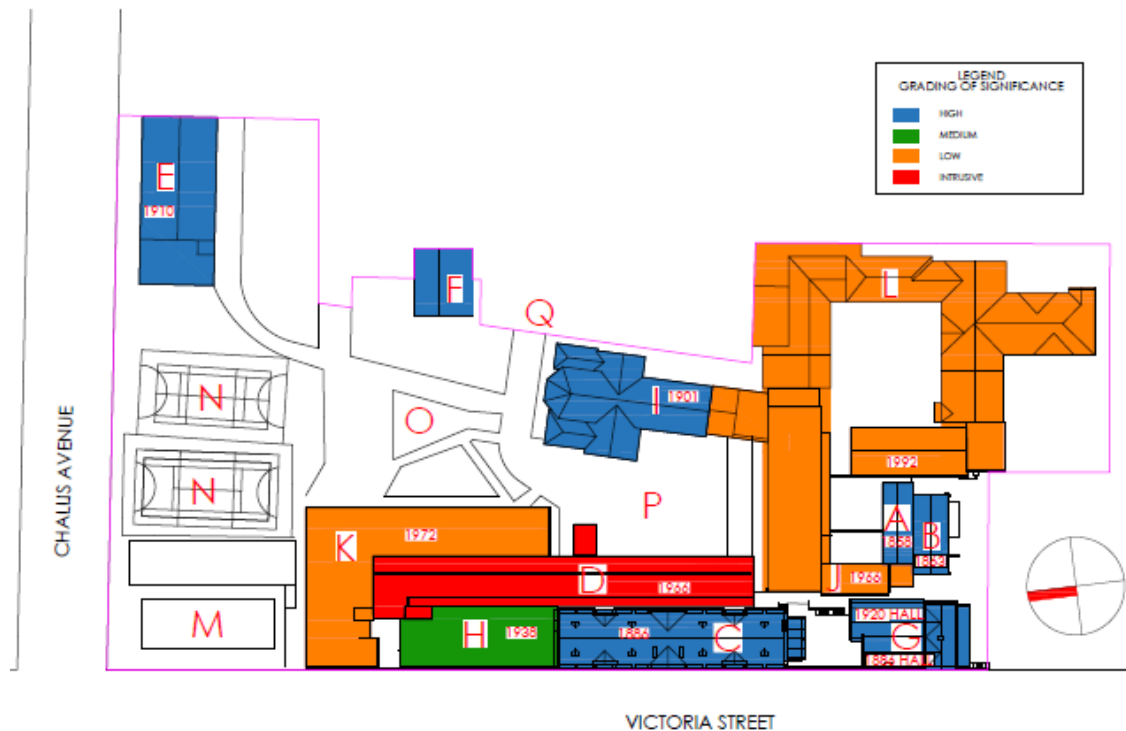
PLAN OF EXISTING BUILDINGS AT ST VINCENT'S COLLEGE
